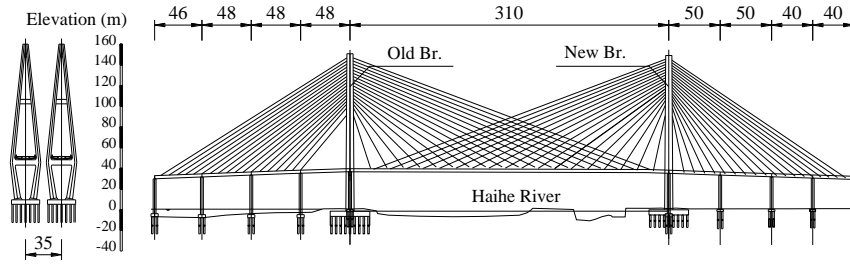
Layout of the old and new Tanggu Bridges (Unit: m) girders.
